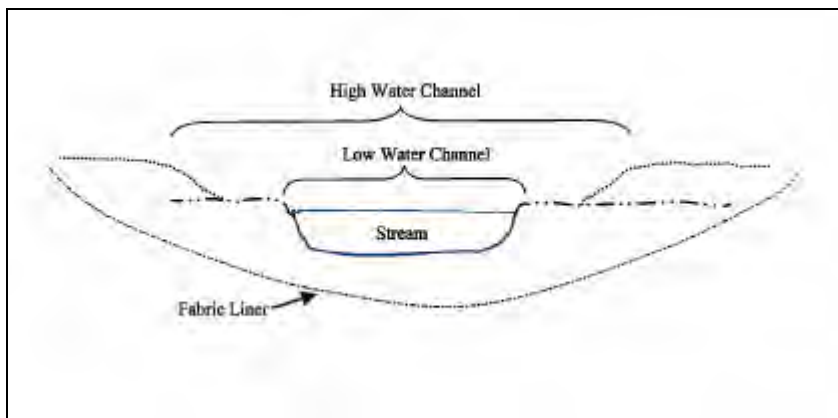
Cross-sectional view of natural barrier stabilization.
